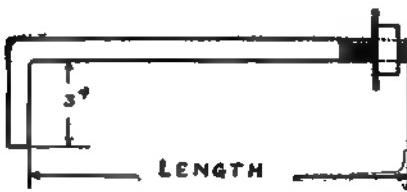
Sill-Ancor, Plate-Bolt or Wall-Plate Anchor.
